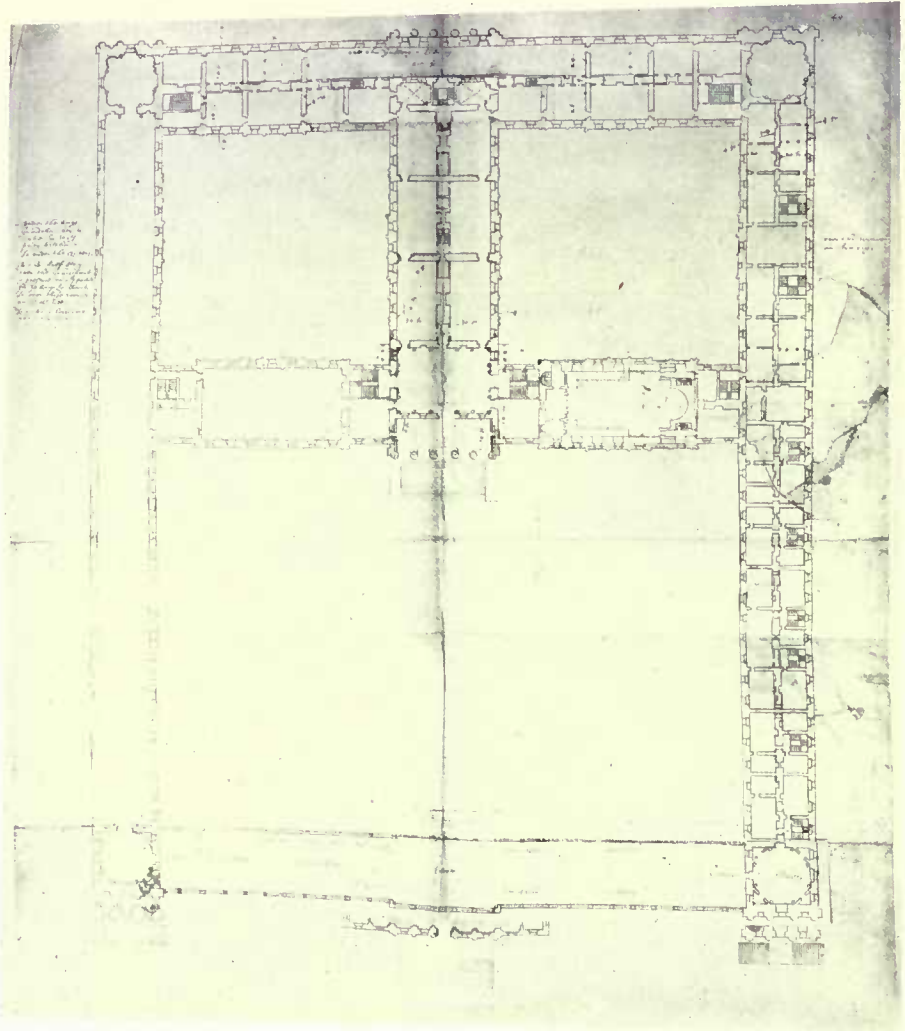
GROUND-FLOOR PLAN, CHATSWORTH A. SCHEME, BY WEBB
